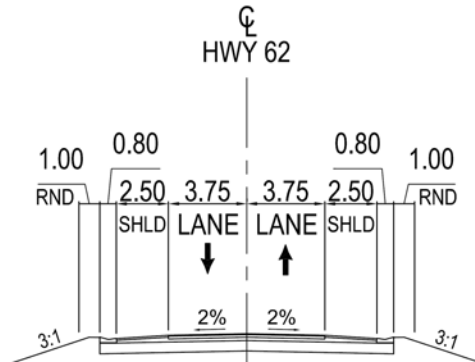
Proposed Two-lane Rural Cross-section for Moira/Ridge Road (Ultimate)
